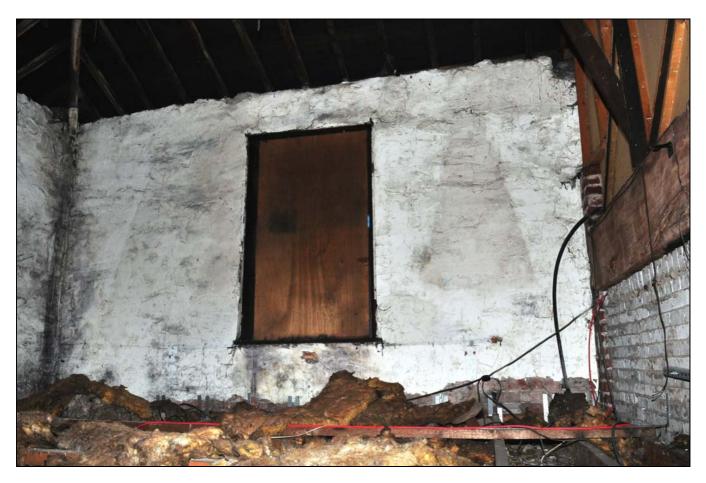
First floor: top floor of Dutton Street dwelling, looking south
